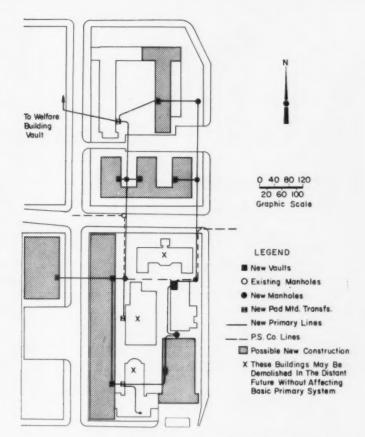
Proposed modifications, shown as alternate methods or stages.
